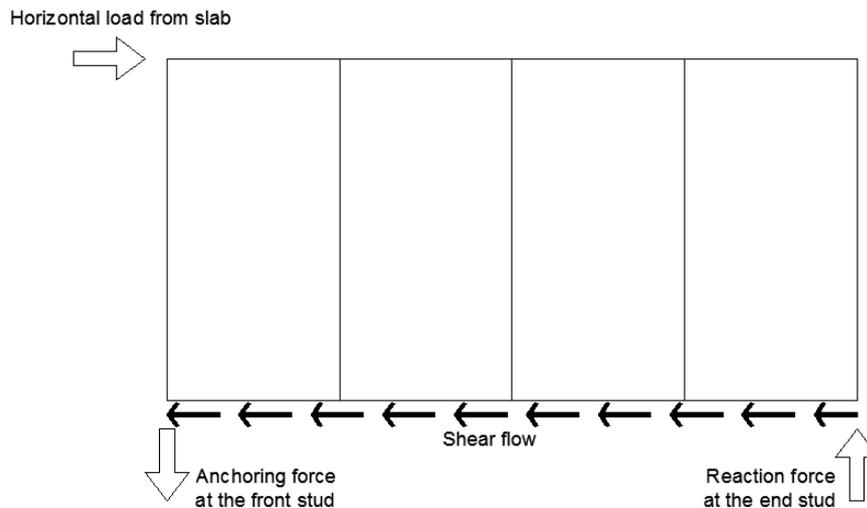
Forces on a single wall when the front stud is completely anchored against lifting.
